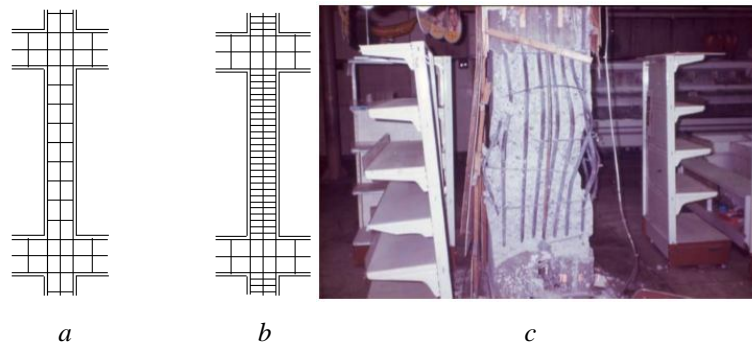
Decreasing distance between stirrups: *a* – before 1970 ($s = 30$ cm); *b* – after 1971 ($s = 10$ cm); *c* – Deteriorate reinforced concrete column due to extensive distance between transverse reinforcing bars corresponding to the reinforcement of *a* (Ishiyama, 2011).
